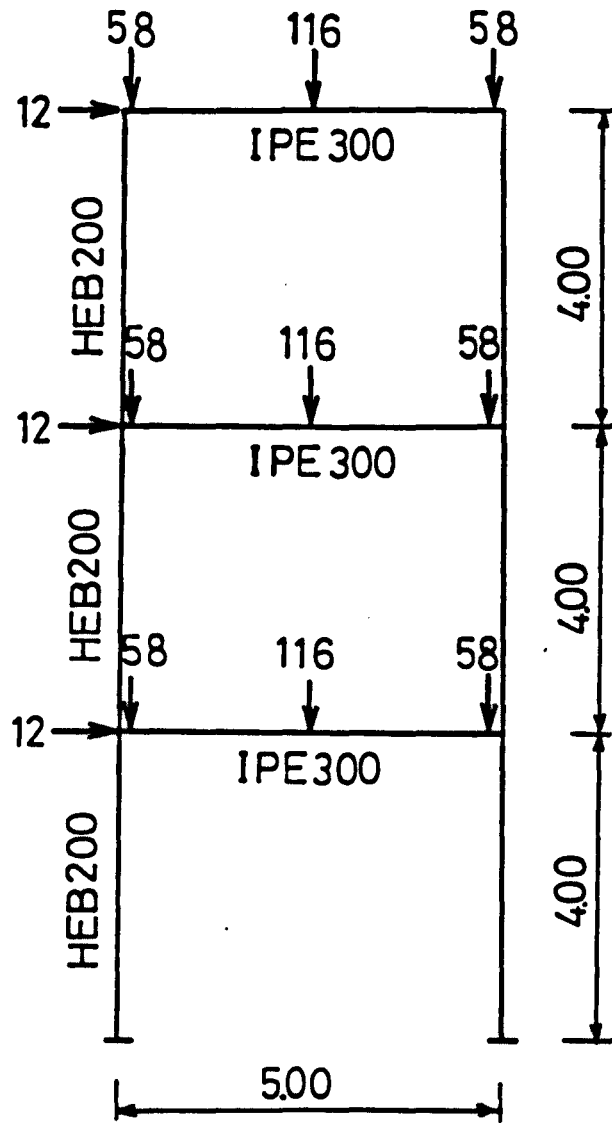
, Three storey, one bay frame used in the determination of collapse load levels
